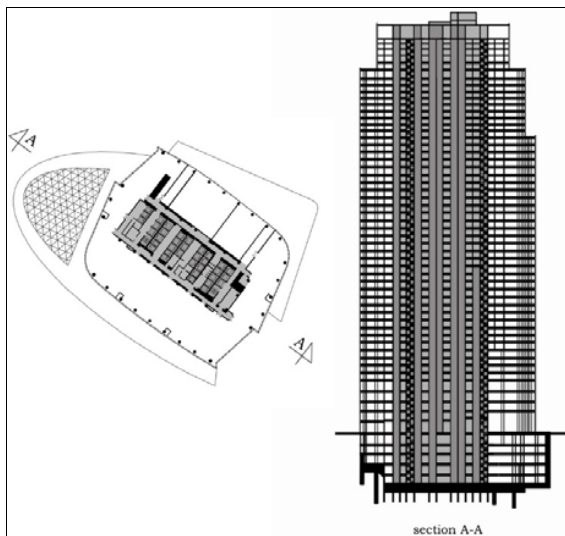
Toranomon Hills Residential Tower: floor plan and section
